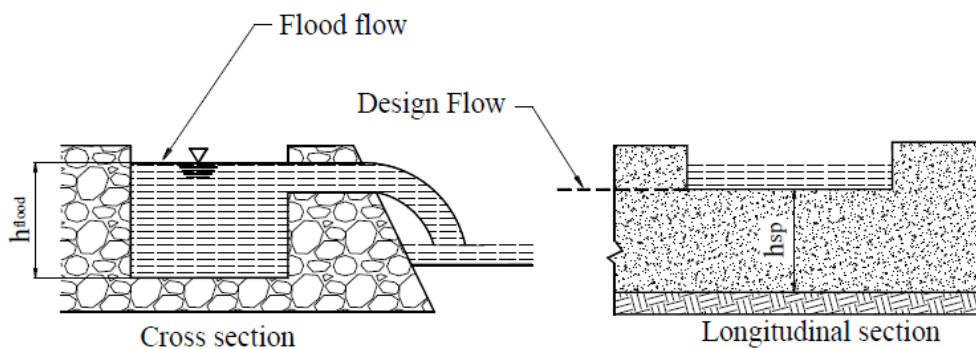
A typical spillway in MHS (Micro Hydropower System) (Pandey B. , 2006)
